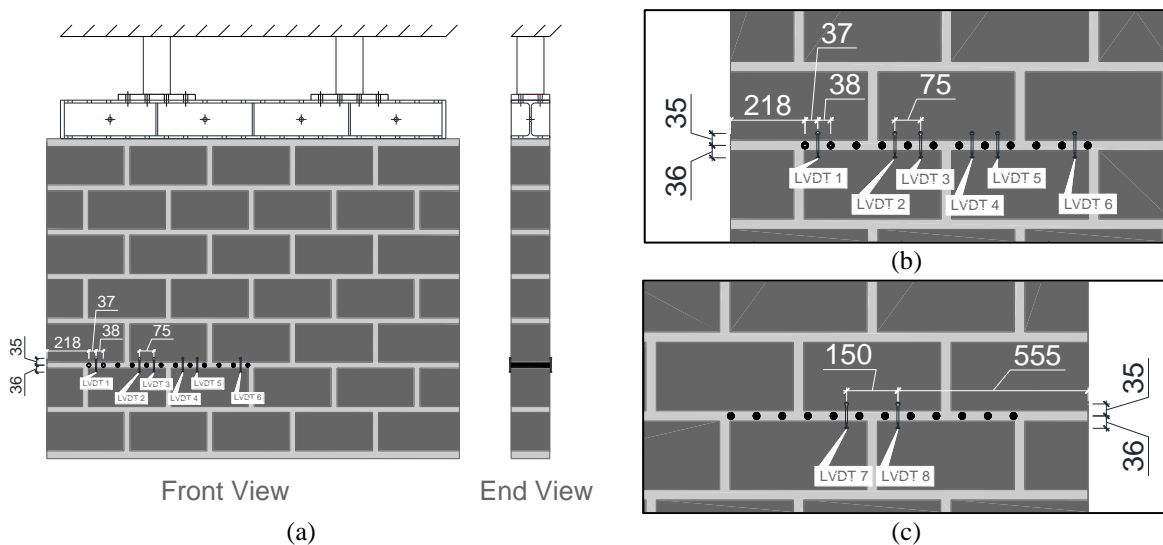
Schematic of the Tube-Jack test set-up: (a) Front and End view of the wall; (b) close-up of the LVDT and hole positions on the front of the wall; and (c) close-up of the LVDT positions on the back of the wall (Dimensions in mm)
